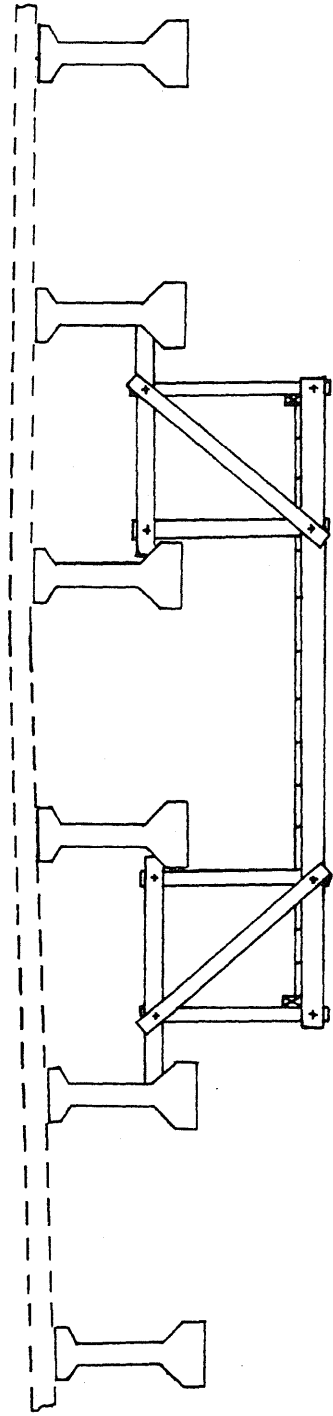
LOCATION OF WOODEN SCAFFOLDING
